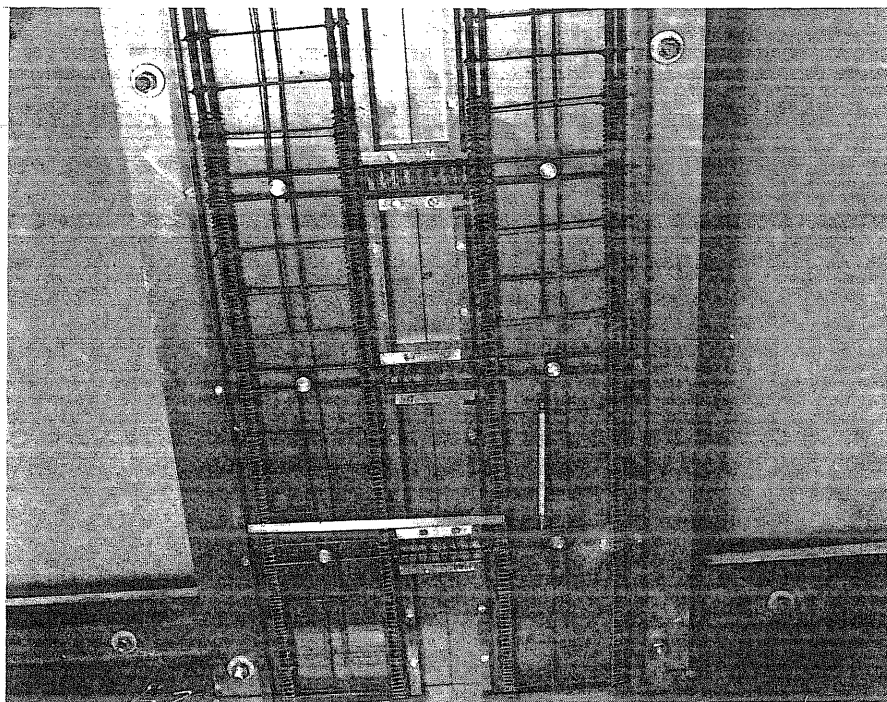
Detail of Reinforcement in the First Three Levels (Frame D)
